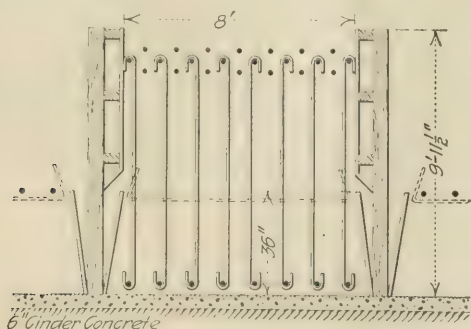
SCHEME OF SUPPORTING SLAB FORMS AND REINFORCEMENT
